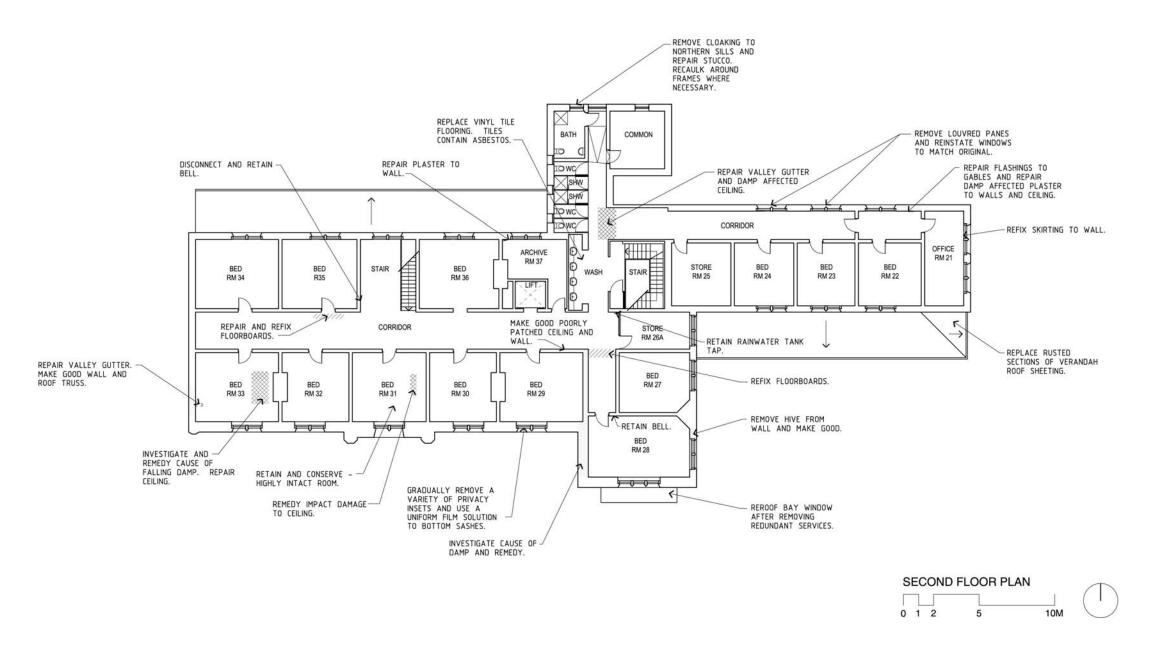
Recommended conservation works, second floor plan. Plan is for diagrammatic purposes only. *Philip Griffiths Architects August 2010.
